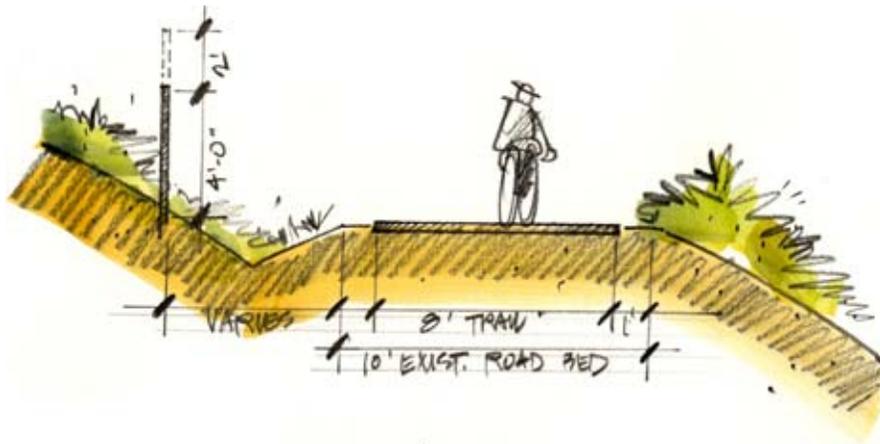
Paved Multi-Use Trail in Landfill on 10' Road Bed
